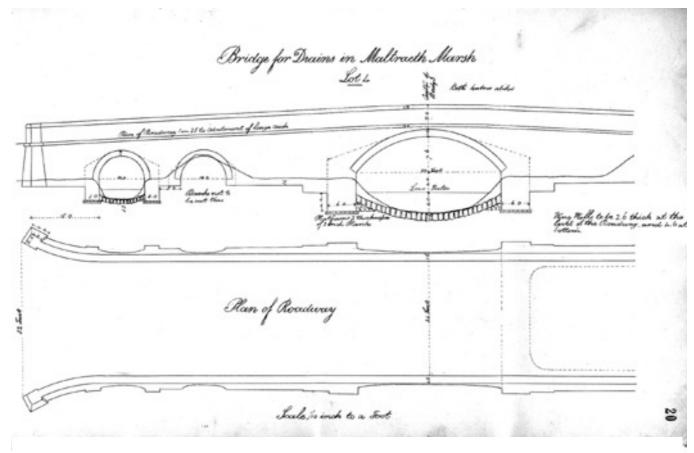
Specification drawing for a bridge over the drains in Malltraeth Marsh [0161] (Public Record Office)
